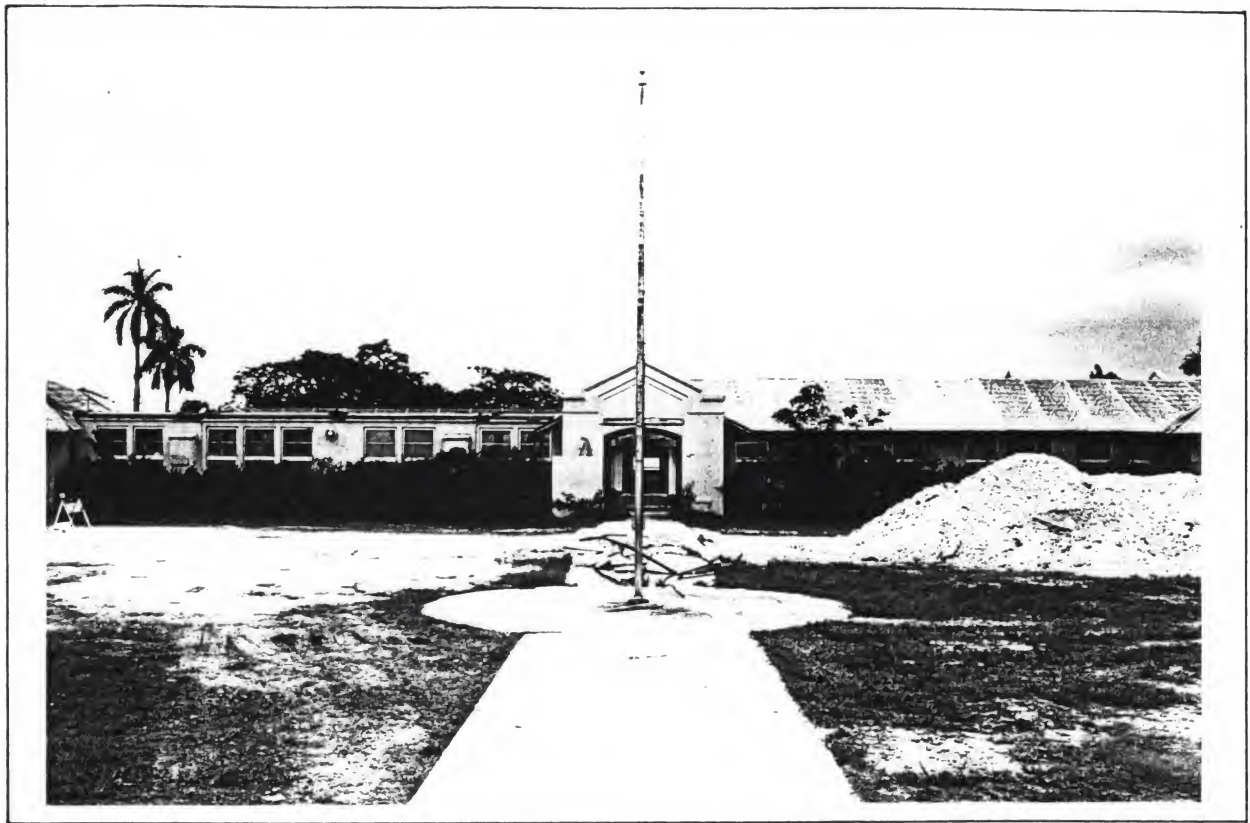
REDLAND ELEMENTARY SCHOOL, WEST ELEVATION, CENTER.
